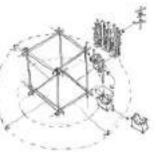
AXONOMETRIC PLEASE REFER TO TECHNICAL SHEETS FOR SCALED DRAWINGS
